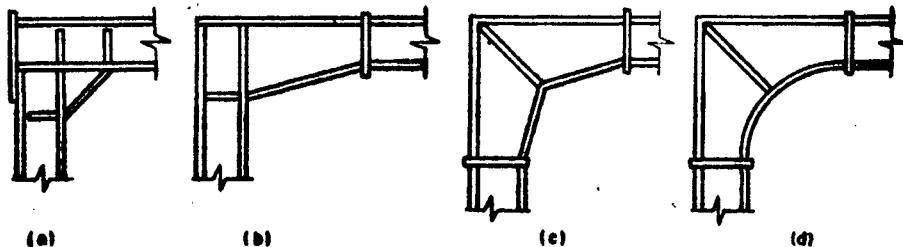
TYPICAL HAUNCHED CORNER CONNECTIONS
